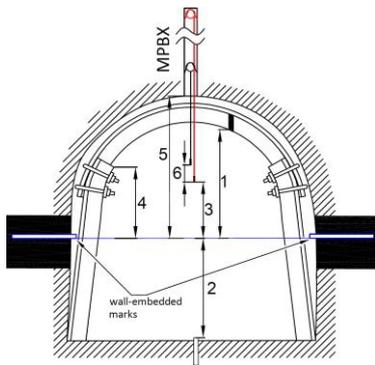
Typical observations of the displacement of support elements and rock mass: 1–5 – linear measurements from the level of wall-embedded marks to: 1 – top section of steel arch; 2 – gateroad floor; 3 – the deepest placed anchor of the extensometer; 4 – end of steel arch rack; 5 – collar of the borehole of extensometer; 6 – displacement of the anchors of extensometer with respect to the deepest (highest) placed anchor
